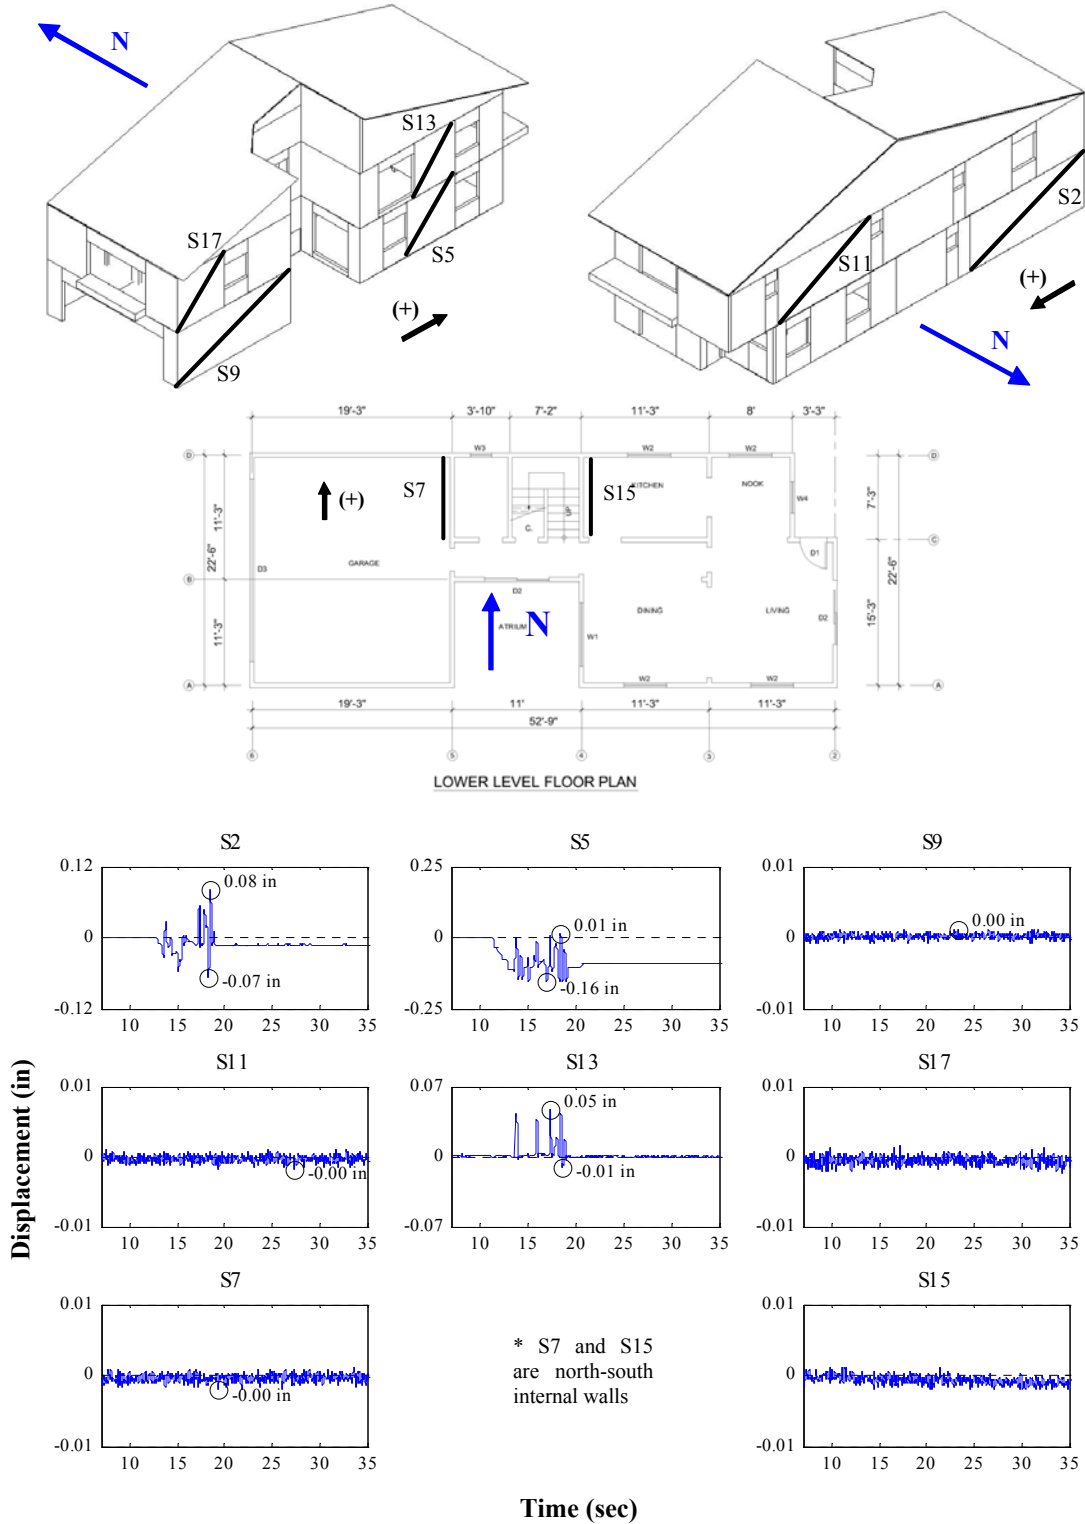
Wall deformations of east-west internal walls for Test NWP2S09
